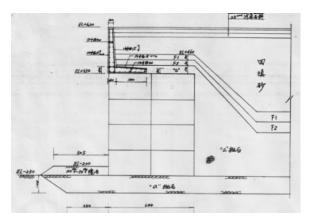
Protruding section 5A/5B. Quay of block wall. Image: CECI
